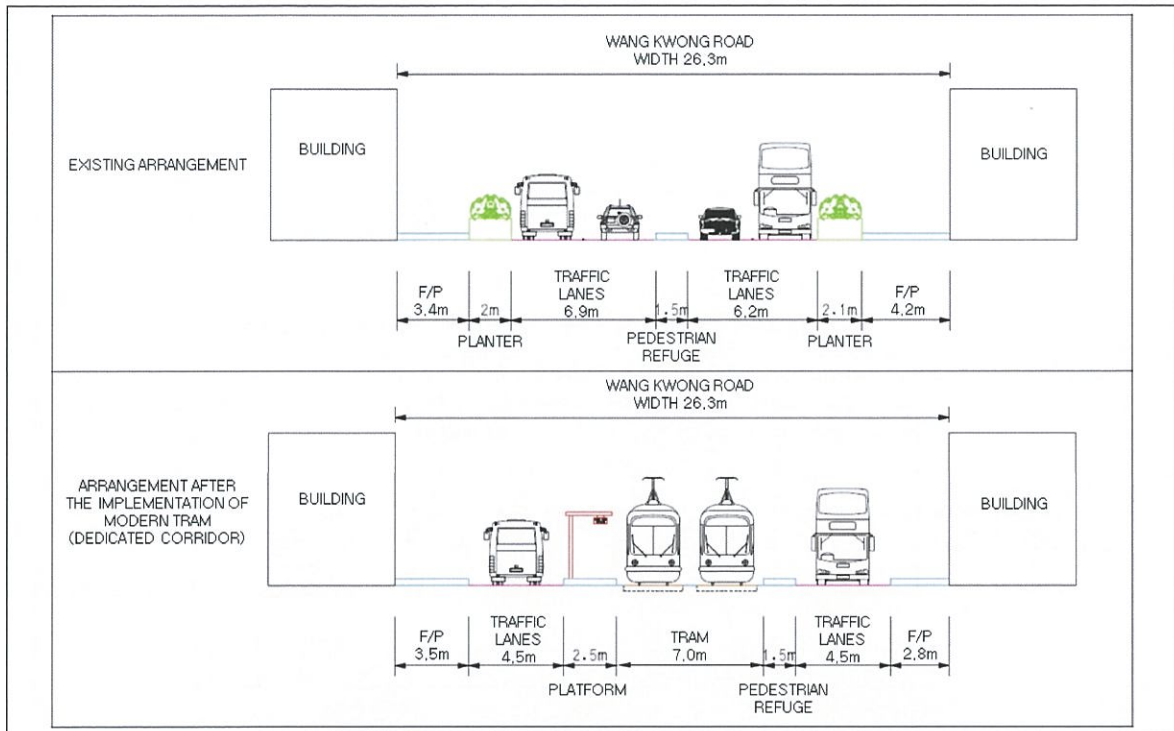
Typical Cross Section Plan of for Option 1 (At-Grade Dedicated Corridor) on Wang Kwong Road (Before and After Implementation)
